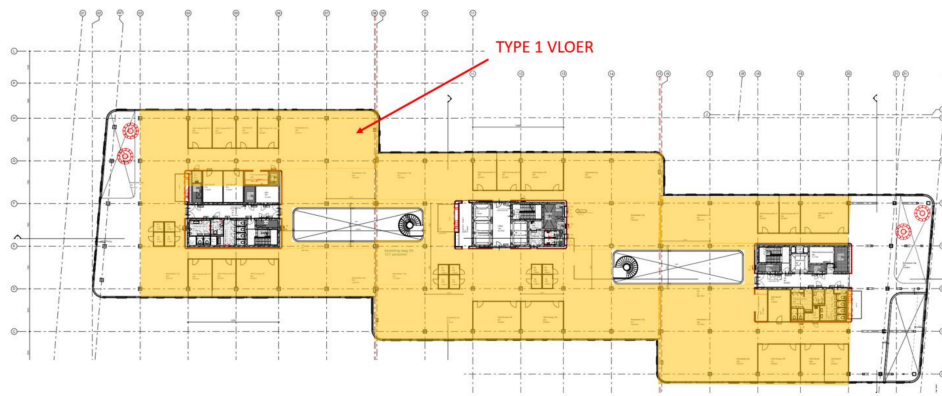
Floor plan of the floors used in the DPG mediavaert building [72].
